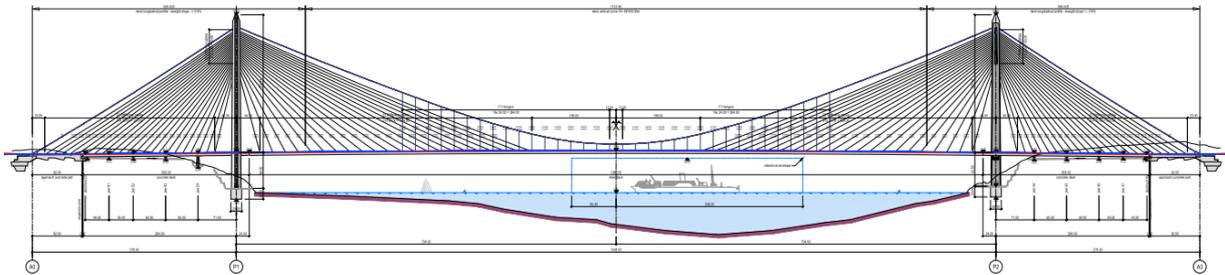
Elevation of the Third Bosphorus Bridge (© T Engineering, Switzerland).
